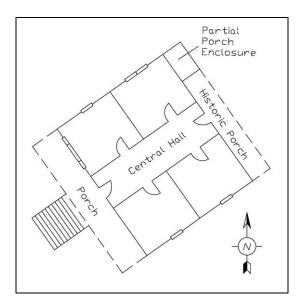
J.H. Sackett House, Floorplan Based on Exterior Observations
